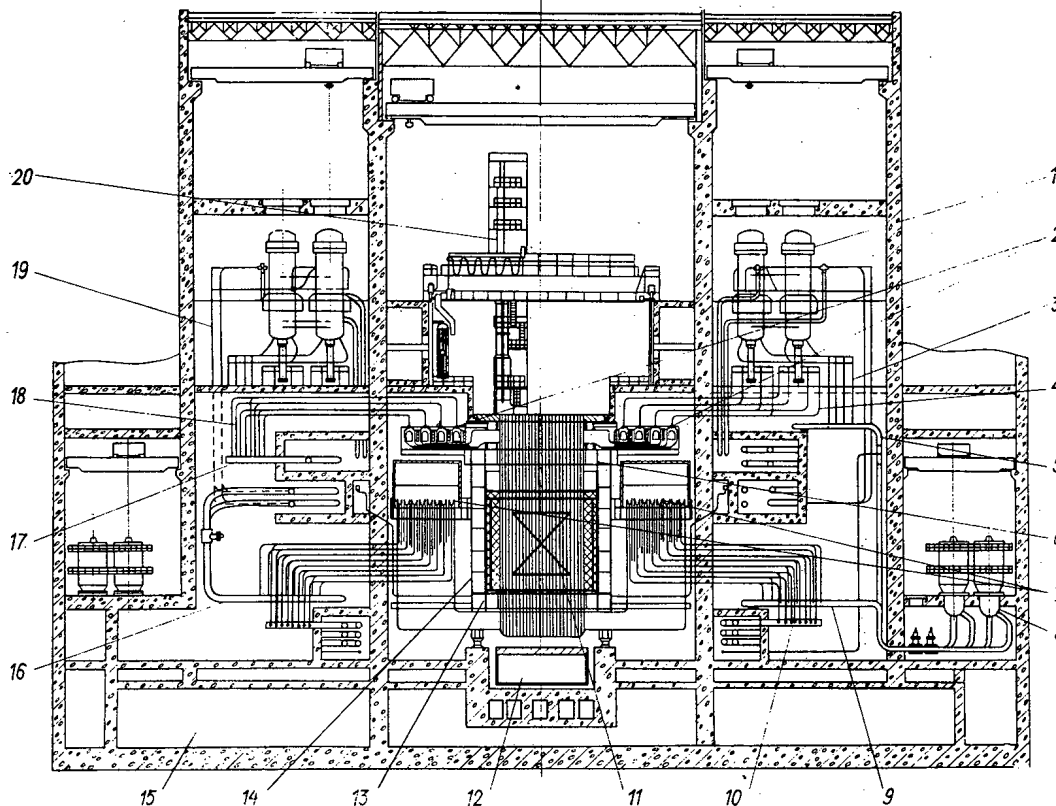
Cross-sectional view of main RBMKP-2400 equipment: 1) steam separator; 2) sectional headers; 3) upper water pipelines; 4) steam-water pipelines; 5) intake manifold; 6) upper unit; 7) distributing headers; 8) main circulating pump; 9) pressure header; 10) feeder water drum; 11) reactor core; 12) lower repair machine; 13) lower unit; 14) lateral unit; 15) tank-bubbler; 16) saturated steam drum; 17) superheated steam drum; 18) superheated steam pipelines; 19) saturated steam drum; 18) superheated steam pipelines; 19) saturated steam pipelines; 20) refueling machine.
